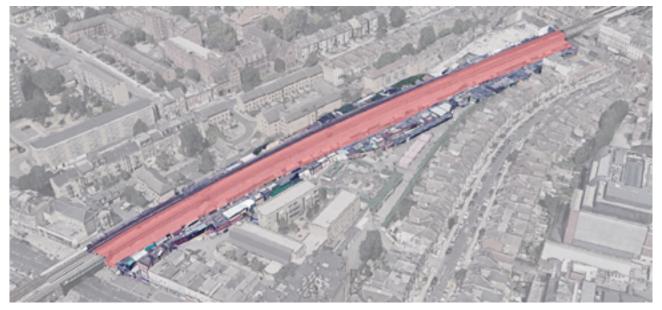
Location of arches 155-191 between Uxbridge Road forming part of Shepherd's Bush Market
